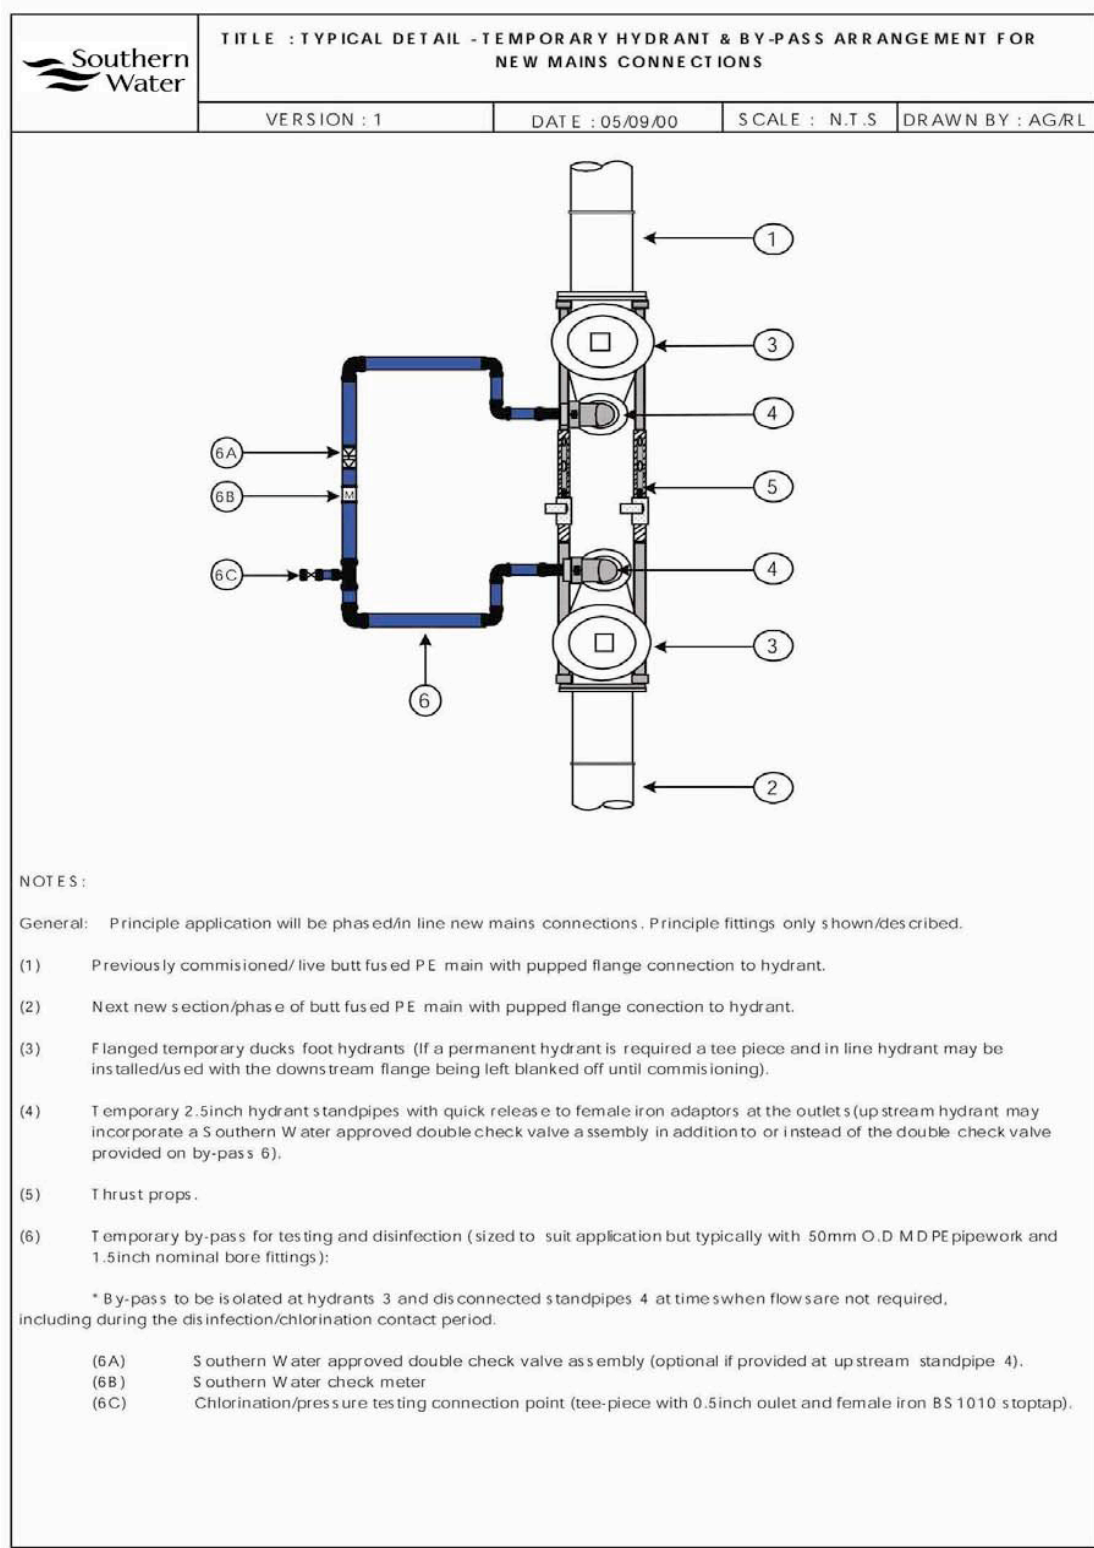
TEMPORARY HYDRANT AND BY-PASS ARRANGEMENT FOR A NEW WATER MAINS CONNECTION
